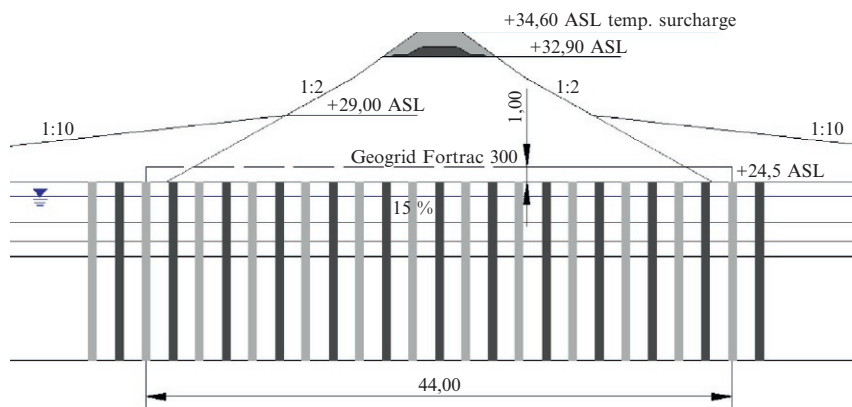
Cross section of the embankment with the GEC-column pattern.
